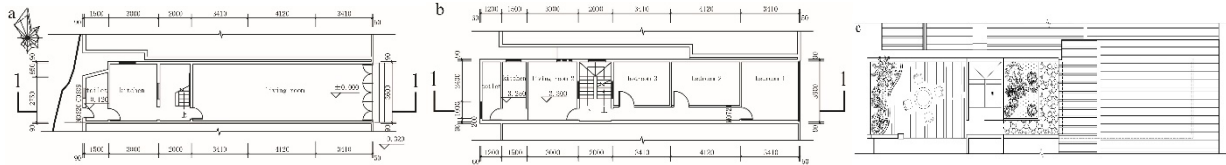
(a) ground floor plan after renovation; (b) second floor plan after renovation; (c) roof plan after renovation.
